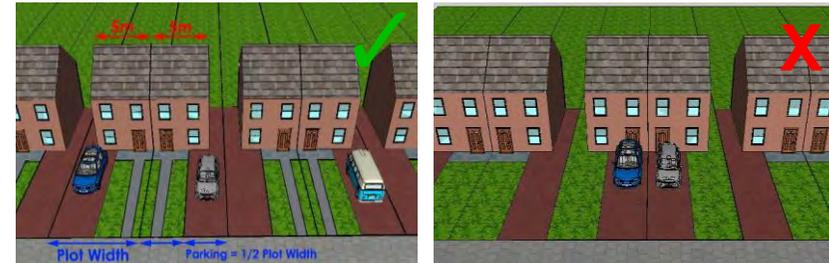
Where appropriate, frontage parking should be combined with planting and/or low walls
